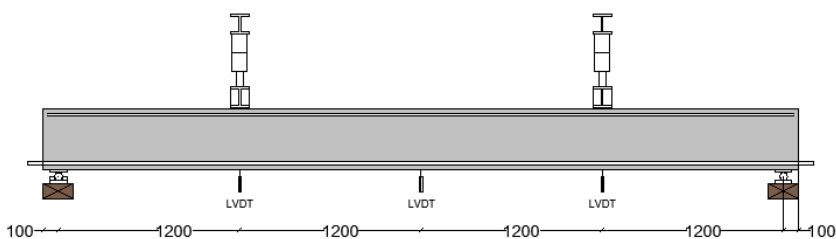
4-point bending test set-up (schematic) (dimensions in mm)
